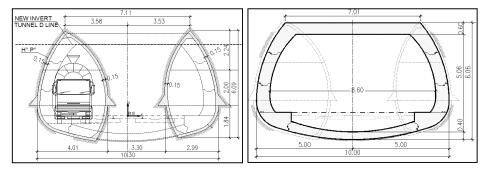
Tunnel Line H crossing under Line D. Cross section and indication of construction procedure.
